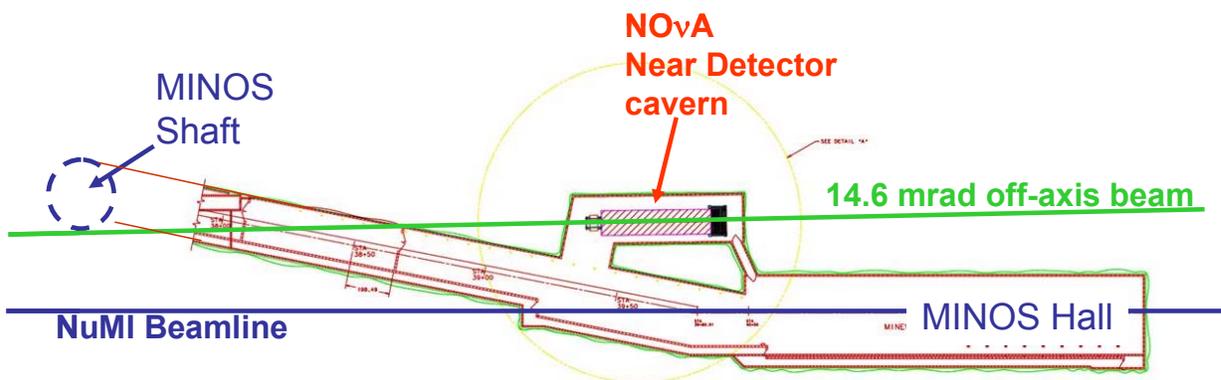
A detailed plan view of the MINOS access tunnel from the vertical MINOS shaft to the MINOS hall. The new NOvA cavern is indicated.
